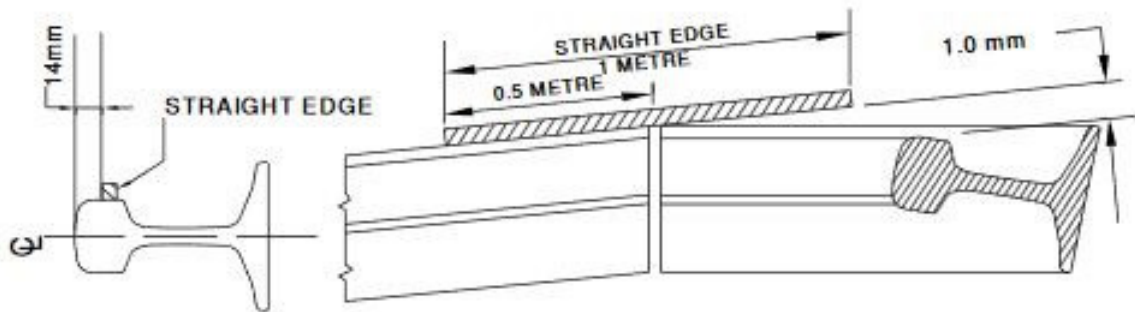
(a) TOLERANCE FOR LATERAL MISALIGNMENT AT THE TIME OF WELDING
